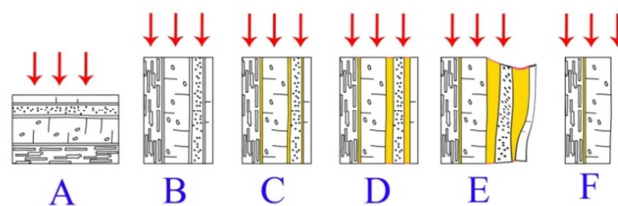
Show red arrows indicate loads located on the Stones, A: Correct position for building stone Loads perpendicular to the Horizontal bedding of stone, B: incorrect position for building stone, C: salt crystal growth in Bedding Plane with yellow color, D: Overgrowth of salt crystal, E: The collapse of the outer layers, F: Exfoliation happen.
